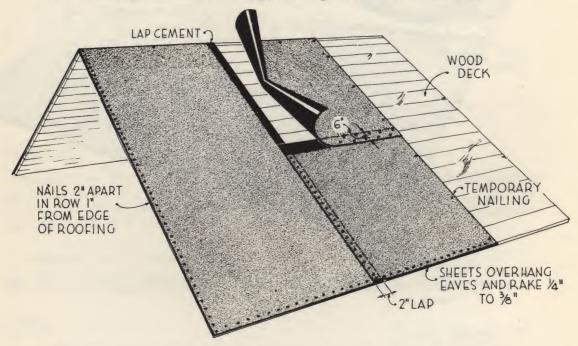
Exposed nail application of roll roofing parallel to the rake.
